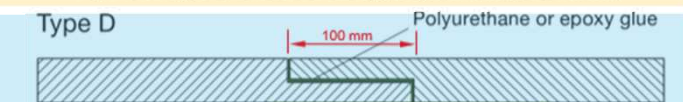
Joint type D, fixed bell and spigot system (adhesive joint)
